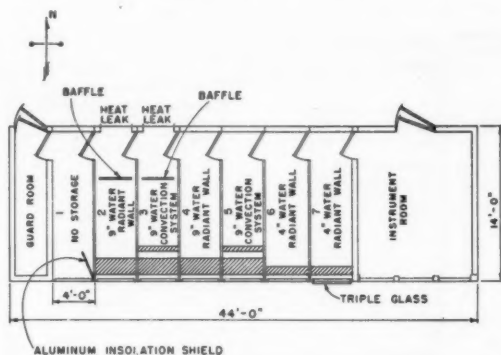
PLAN OF TEST HOUSE SHOWING ARRANGEMENT OF TEST CELLS
